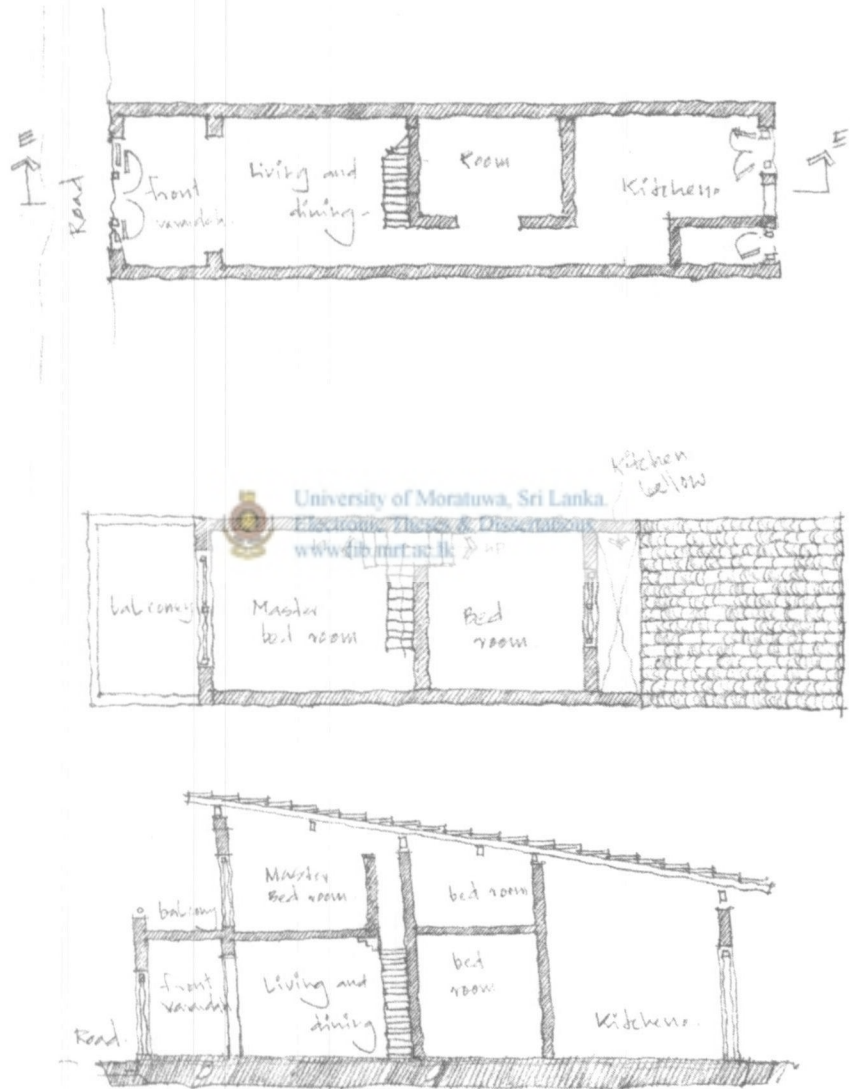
a) , b) and c) : ground floor plan, upper floor plan and section of House- 4. Since there are no provisions for change in the ground floor, the addition of an upper floor is seen. (source: personal sketches)
